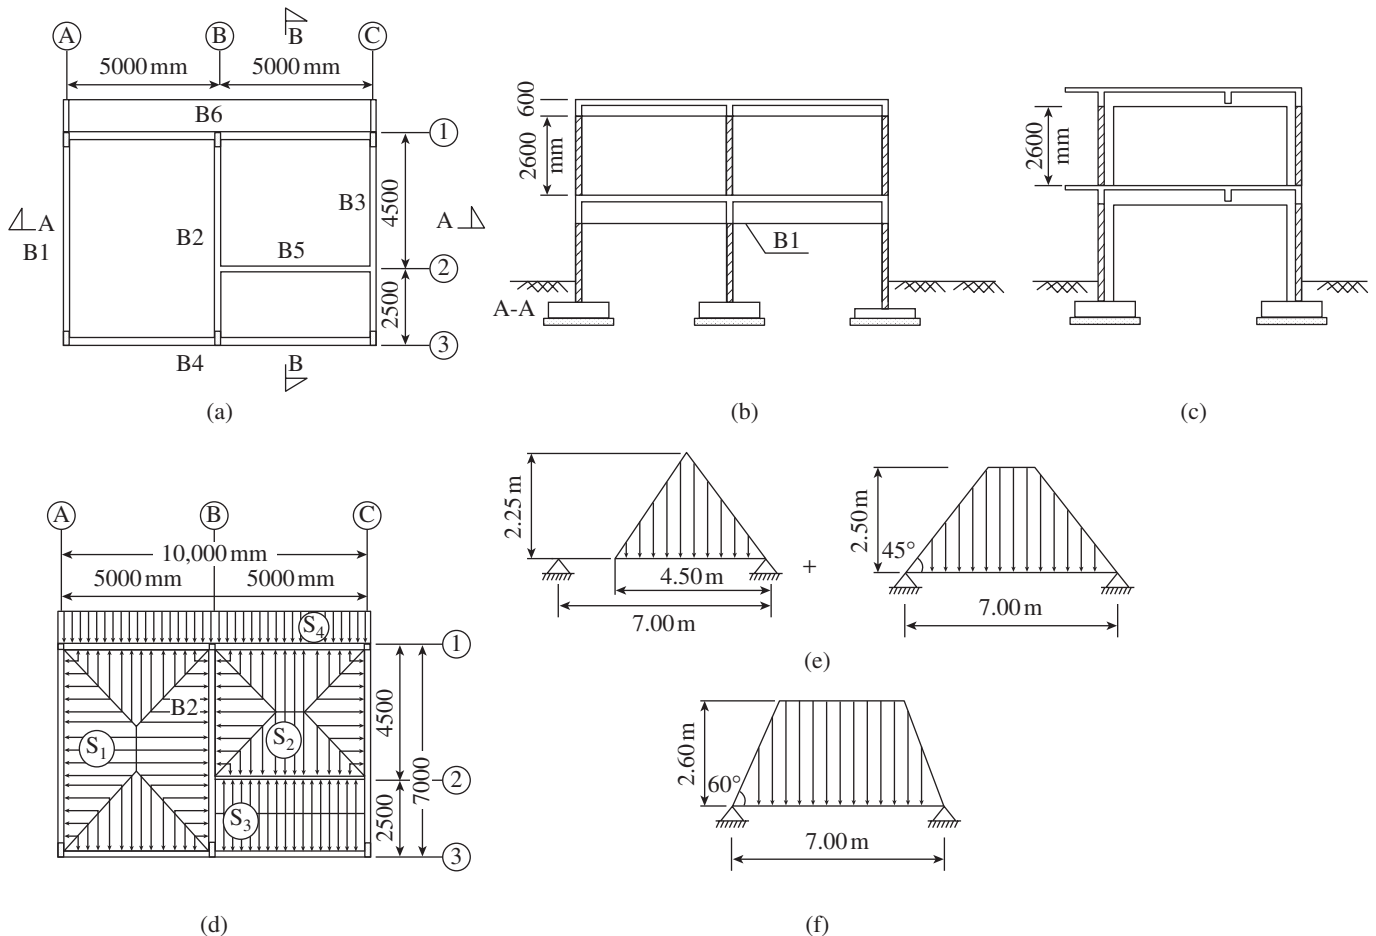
Slab of Example 3.2 (a) Plan (b) Section A-A (c) Section B-B (d) Load distribution of slabs (e) Direct slab load on beam B2 (f) Direct wall load on beam B2
